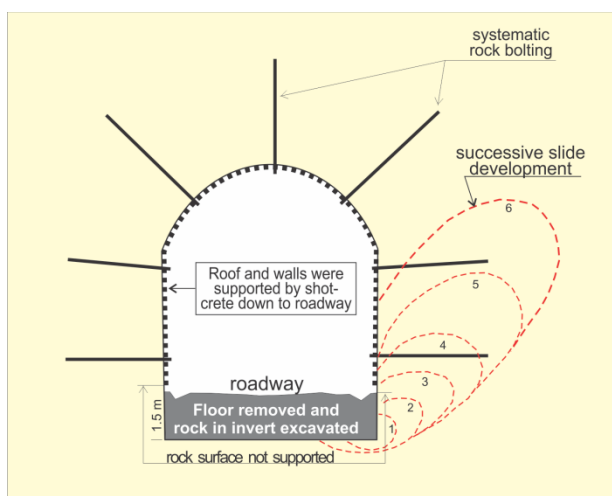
Possible development of the failure, mainly in the right side (looking downstream)
